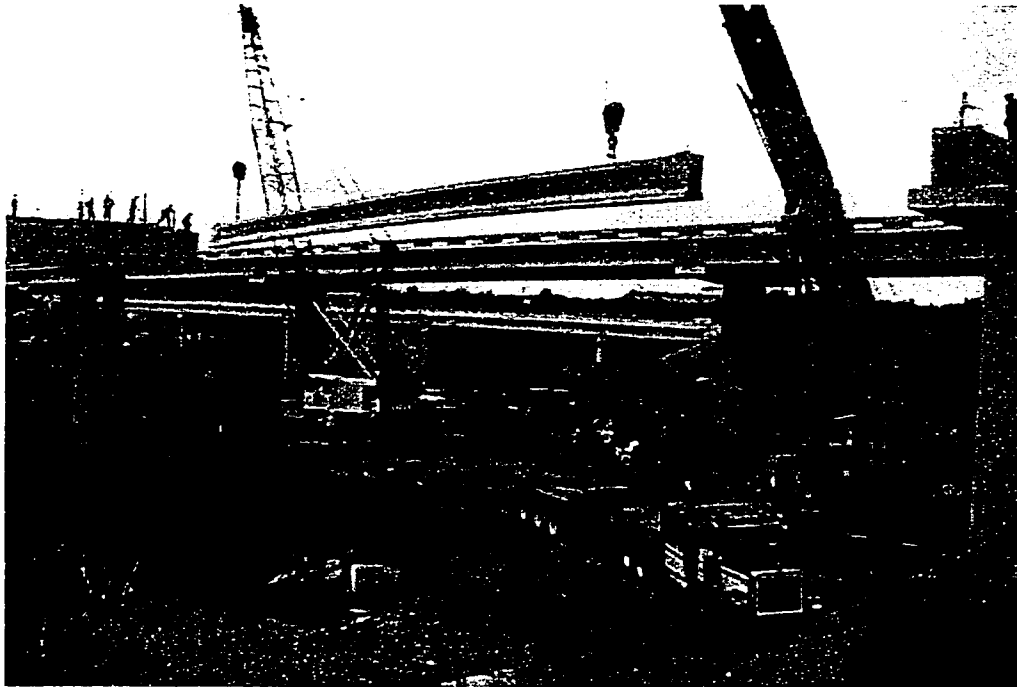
Erection of San Angelo Eastbound HPC Type IV Beams at Jobsite
